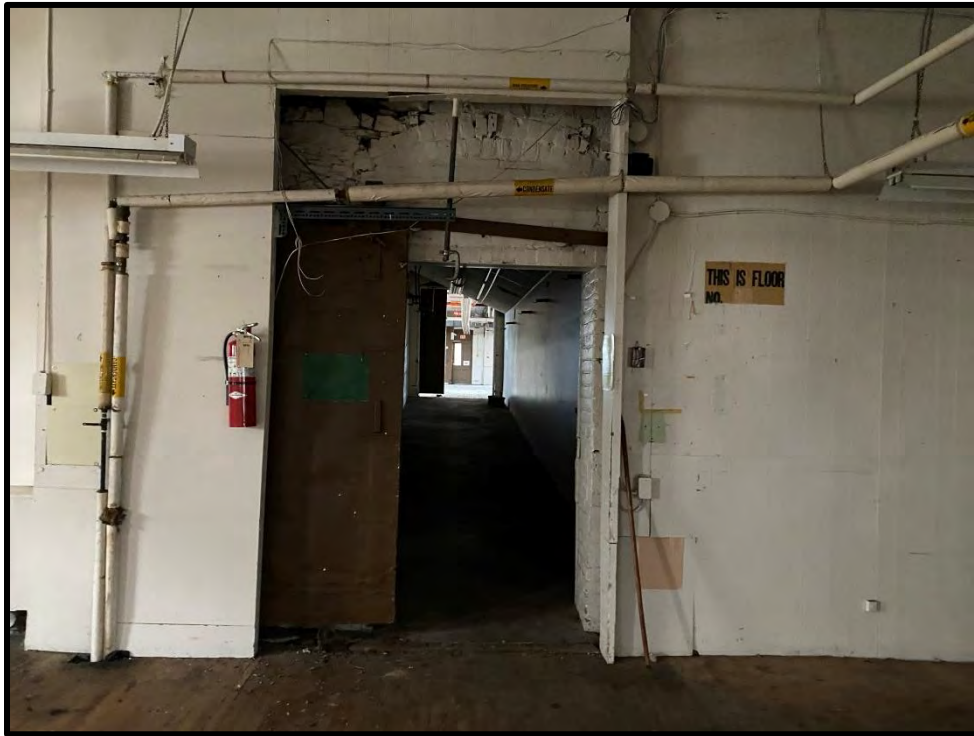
Fourth Floor Stone Building – Opening to Brick Building
